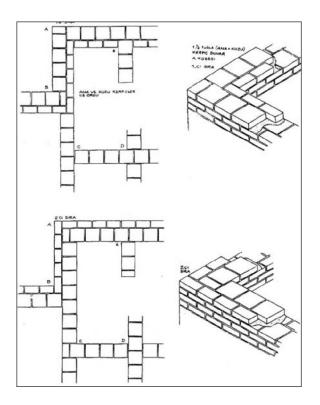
Example of adobe wall arrangement and corner view [39]
